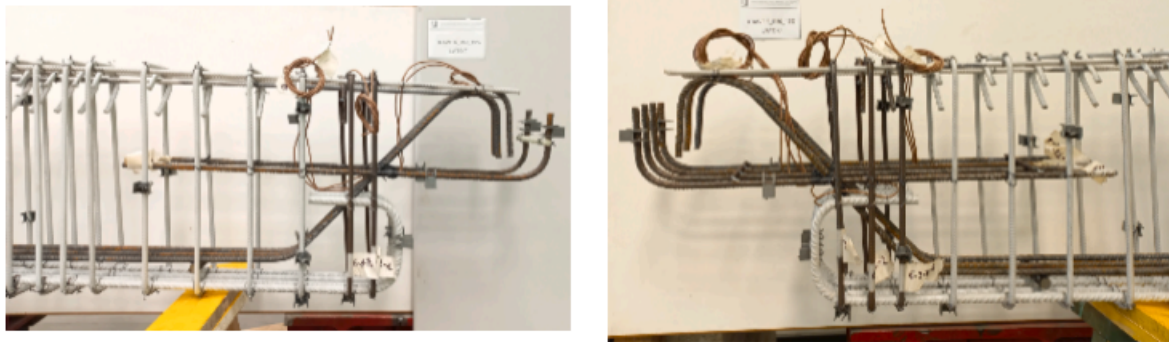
Steel cage of the corroded specimens (left : G1-C, right : G2-C) [18]
